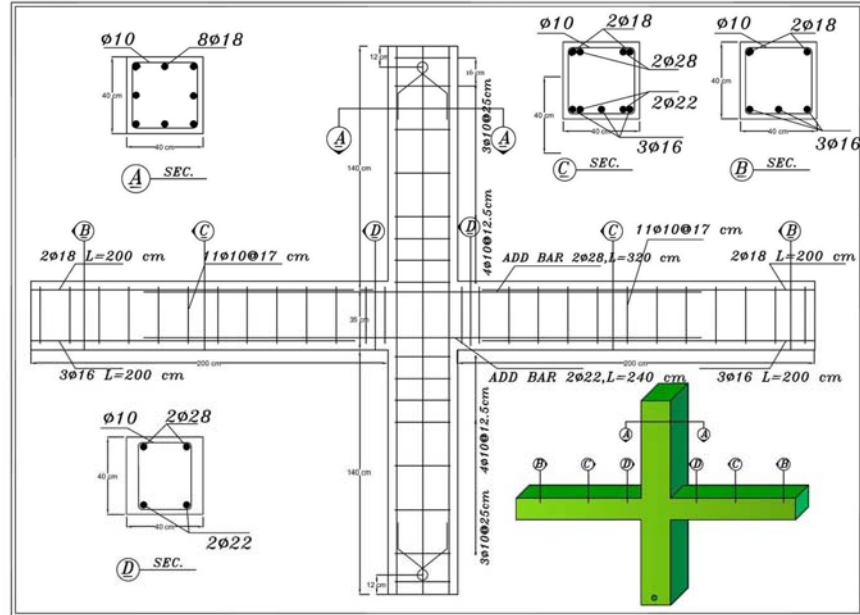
Dimensions and reinforcement details of Monolithic Specimen
